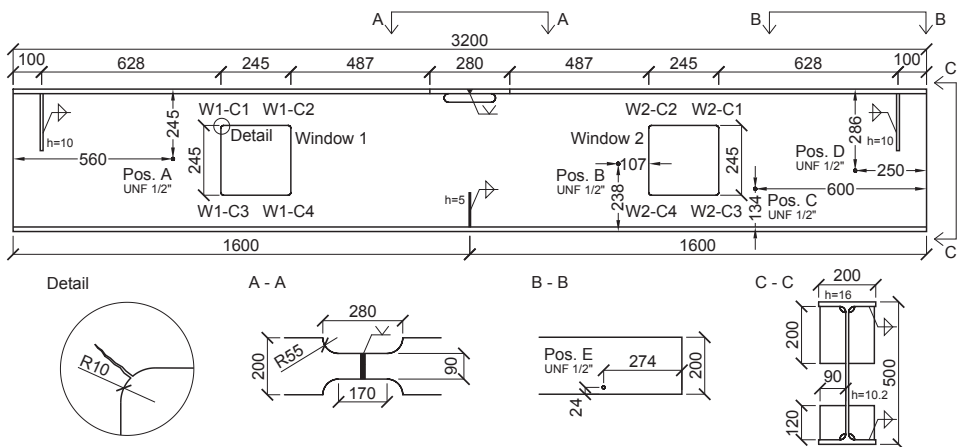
Dimensions, cracks and coupling positions of the investigated steel girder IPE 500 made from S355J2+N.
